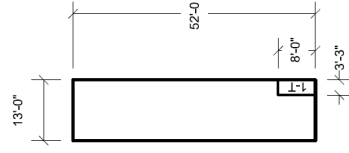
H.6-81: PUMP HOUSE EAST BUTTRESS LOOKING NORTH & PUMP HOUSE WEST BUTTRESS LOOKING SOUTH
